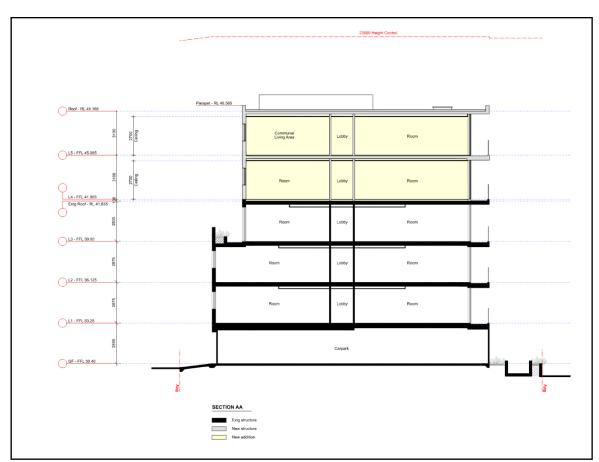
Proposed Section for 2 Anzac Parade, Kensington (Source: Applicant)
